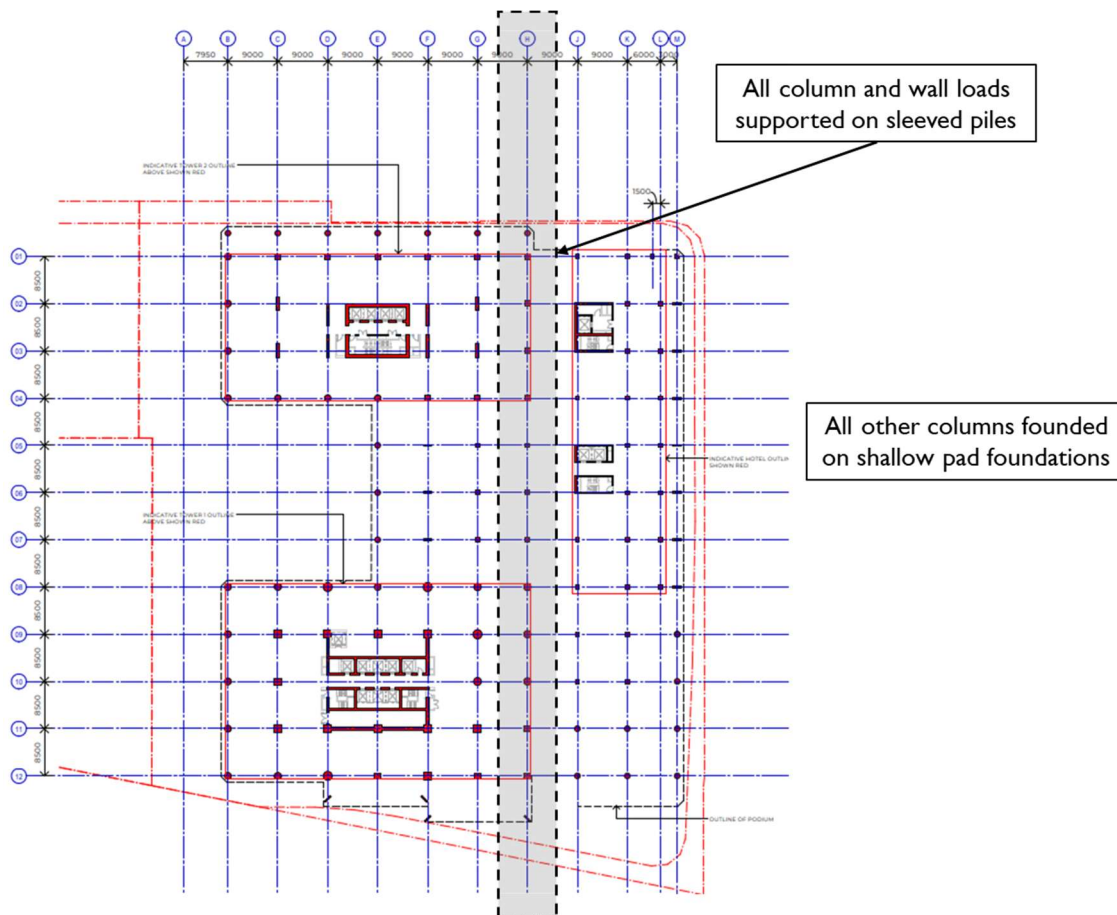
Building Plan Showing Location of Sleeved Piled Foundations
